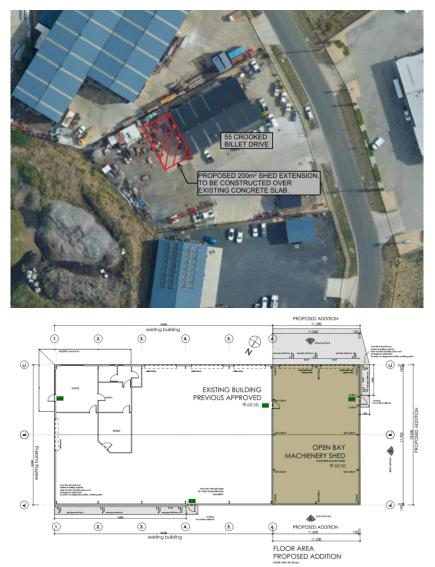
Aerial imagery indicating shed location relative to existing concrete slab, and building designer dimensions of proposed extension
